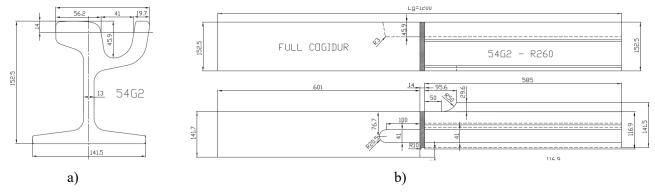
Cross section of tram rail 54G2 (a); preparation of the joint of the rail and the welding block (b)
